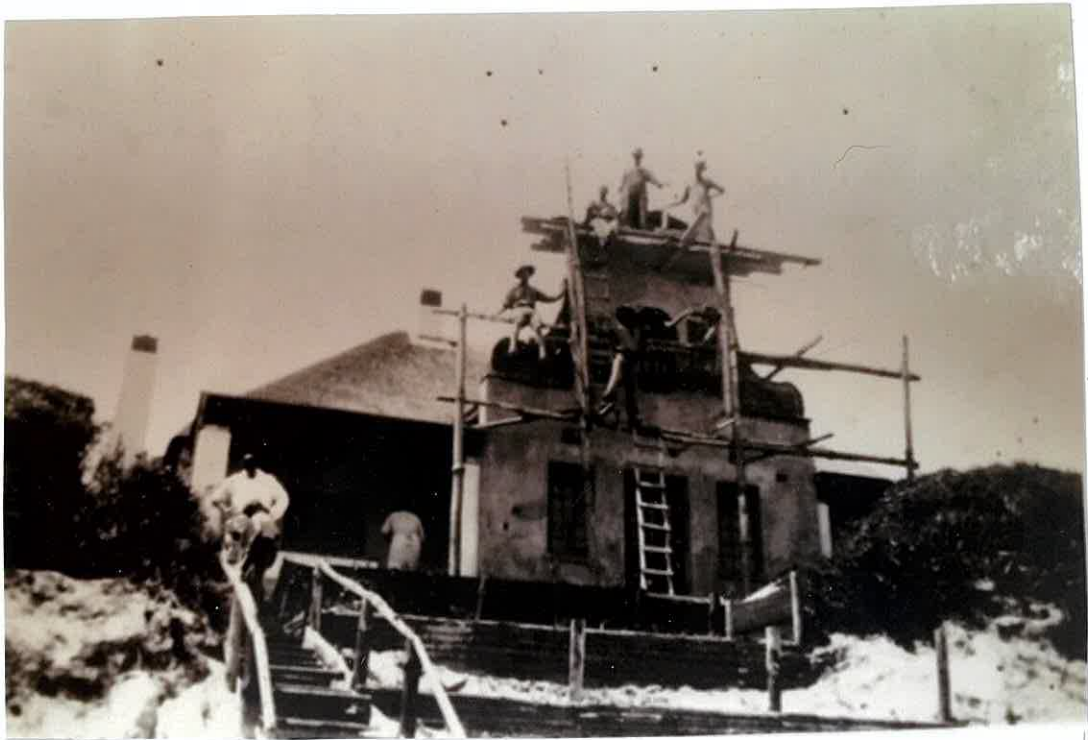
House under construction on Erf 90, Sands Road, Wilderness in December 1933.
